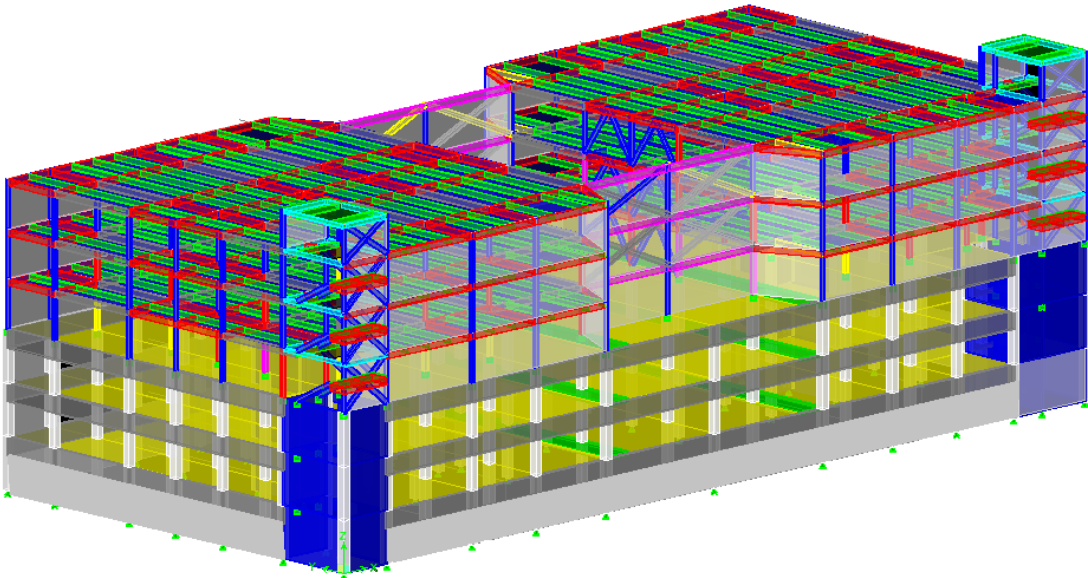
ETABS Finalized Design Showing Steel Frame and Concrete Parking Garage
